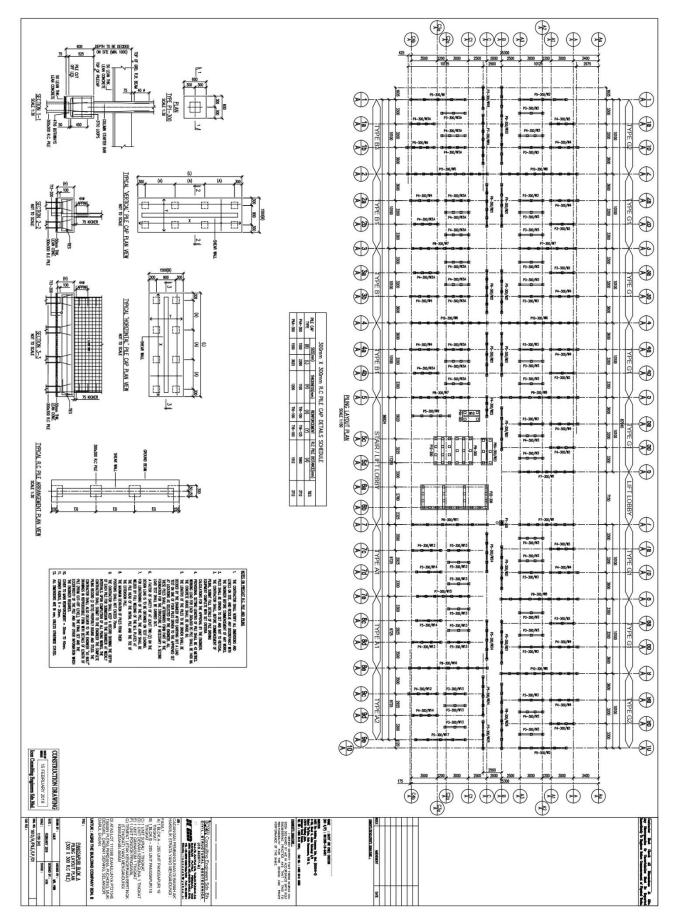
Piling Layout and Details for Block A & Block D (mirror)
